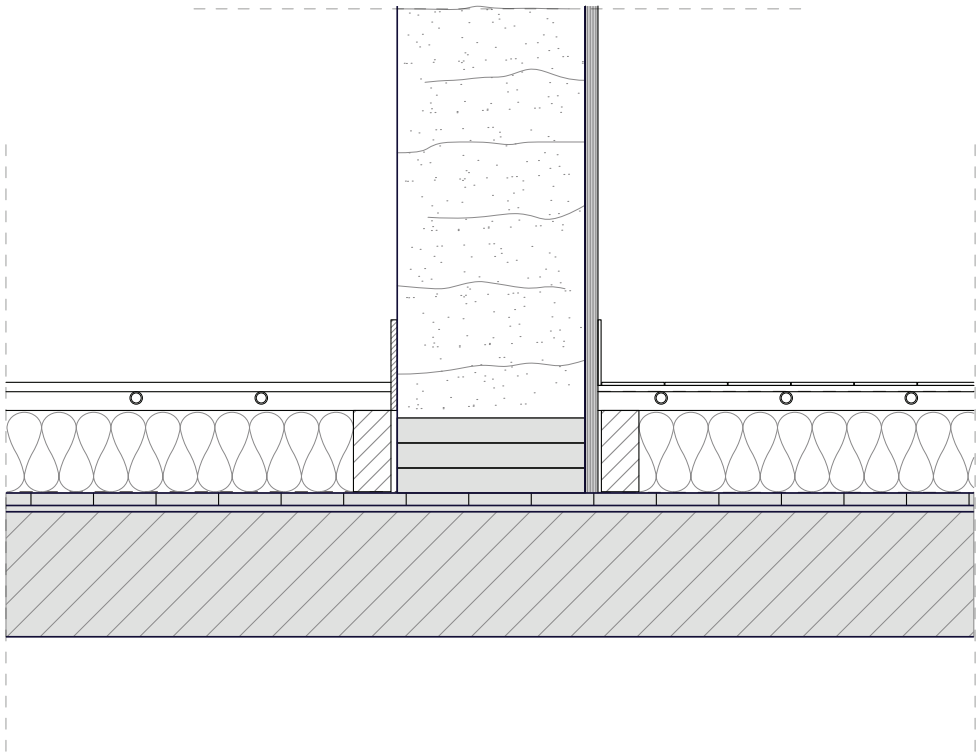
| Detail C, Service core wall-floor: existing concrete floor slab with tiles, timber floor structure, insulation layer, dry underfloor heating system, wooden floorboard, rammed demolition waste wall, concrete plywood
